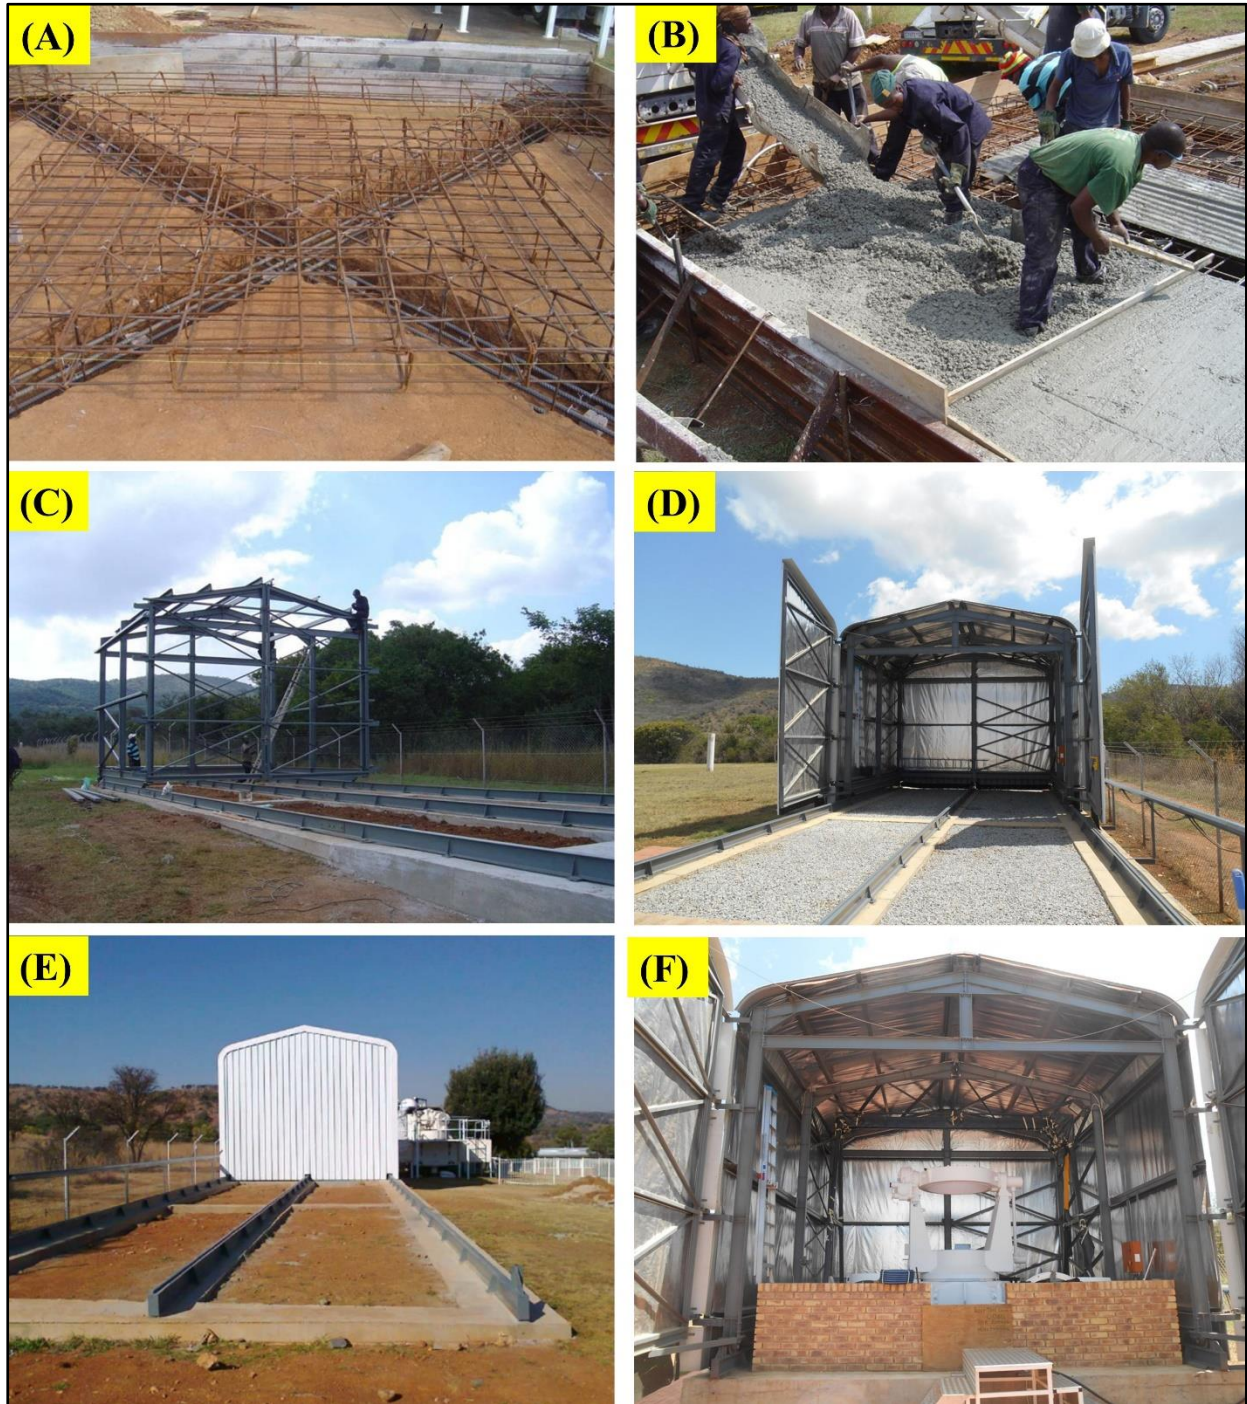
Development of the LLR telescope foundation which include, the massive steel foundation key for the stability of the telescope structure and pointing tests (A), 30 m³ of concrete to produce a steel reinforced concrete floor (B), telescope mobile enclosure or housing designed to run-off the steel tracks (C, D and E), and the housed LLR telescope installed on its foundation (F). Picture credit: Ludwig Combrinck.
